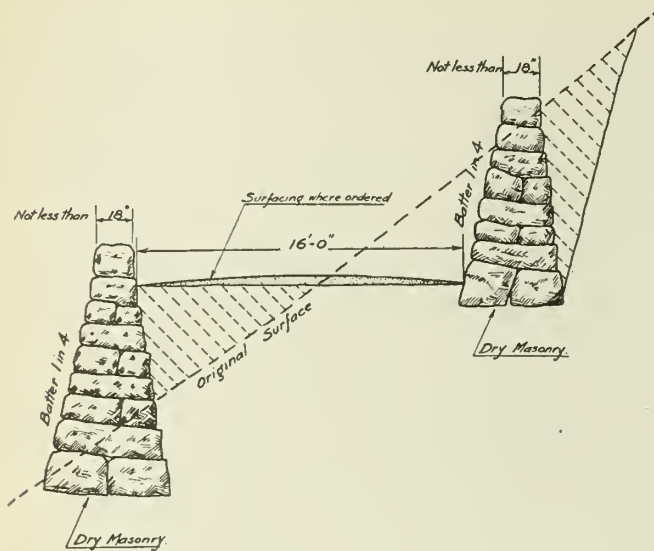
Typical Section with Retaining Walls in Loose Rock or Earth.
